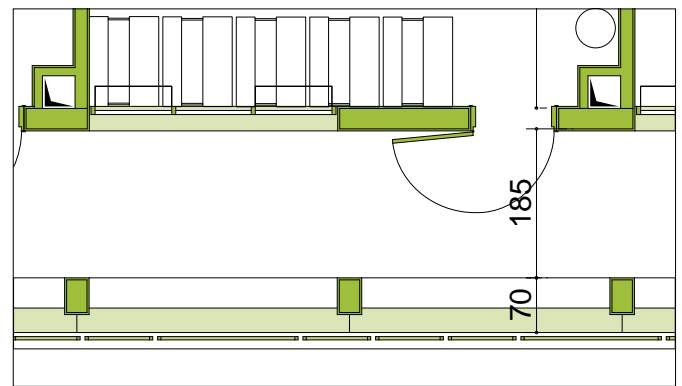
Continuous bench between the corridor columns in Jad Allah Shnan School extension.
